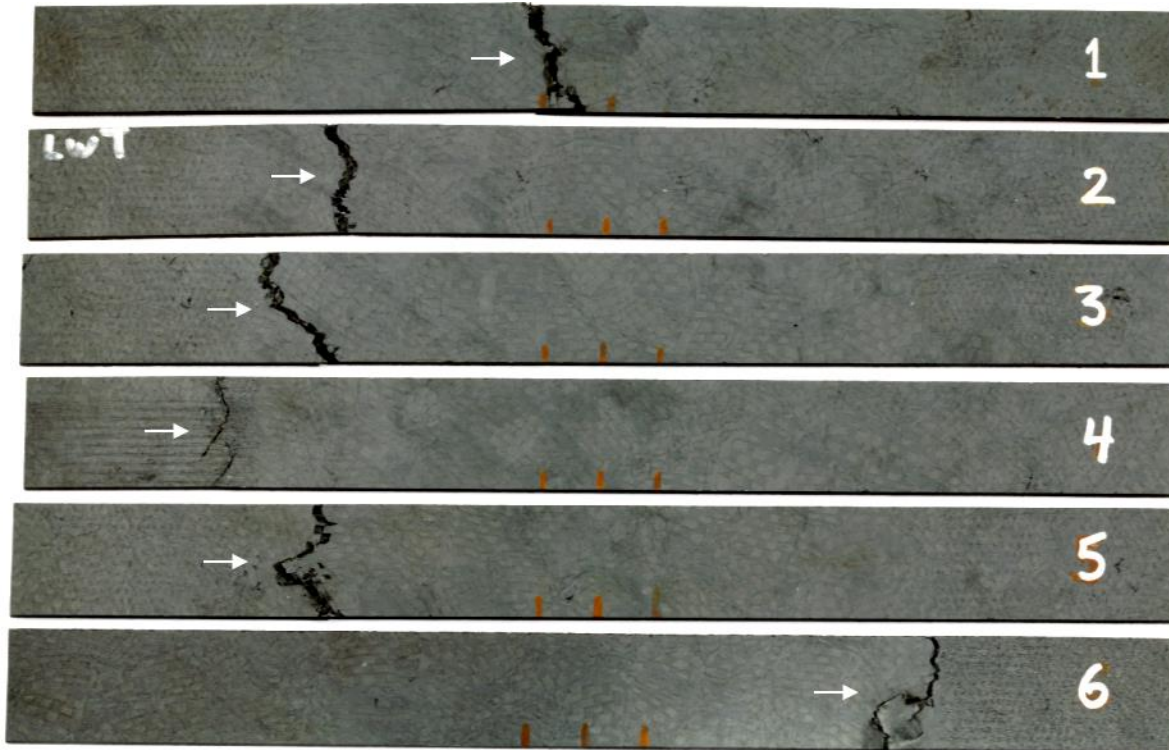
Picture of tested M34 specimens; white arrows indicate the location of failure.
